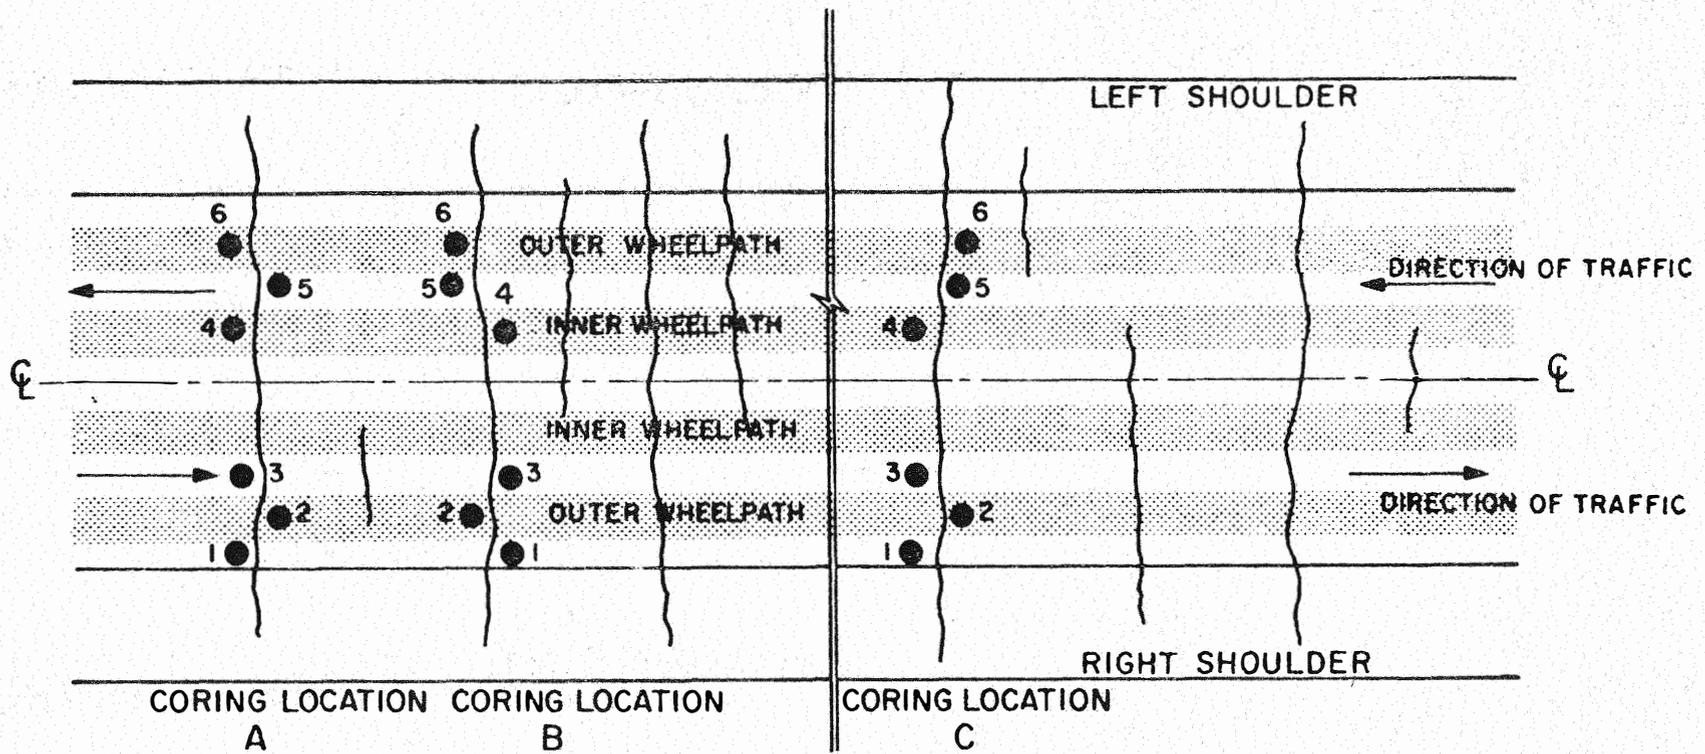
A General Layout of Coring Plan for a 2-Lane Test Site
